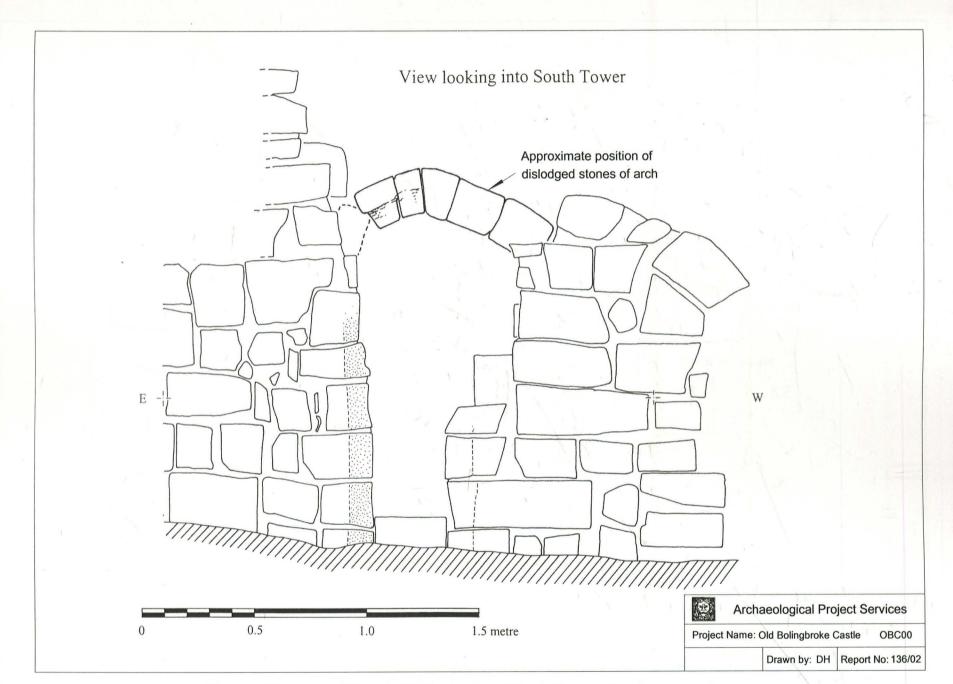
Elevation of Curtain Wall, exterior of South Tower, showing approximate original positions of displaced stones and where dislodged masonry was located
